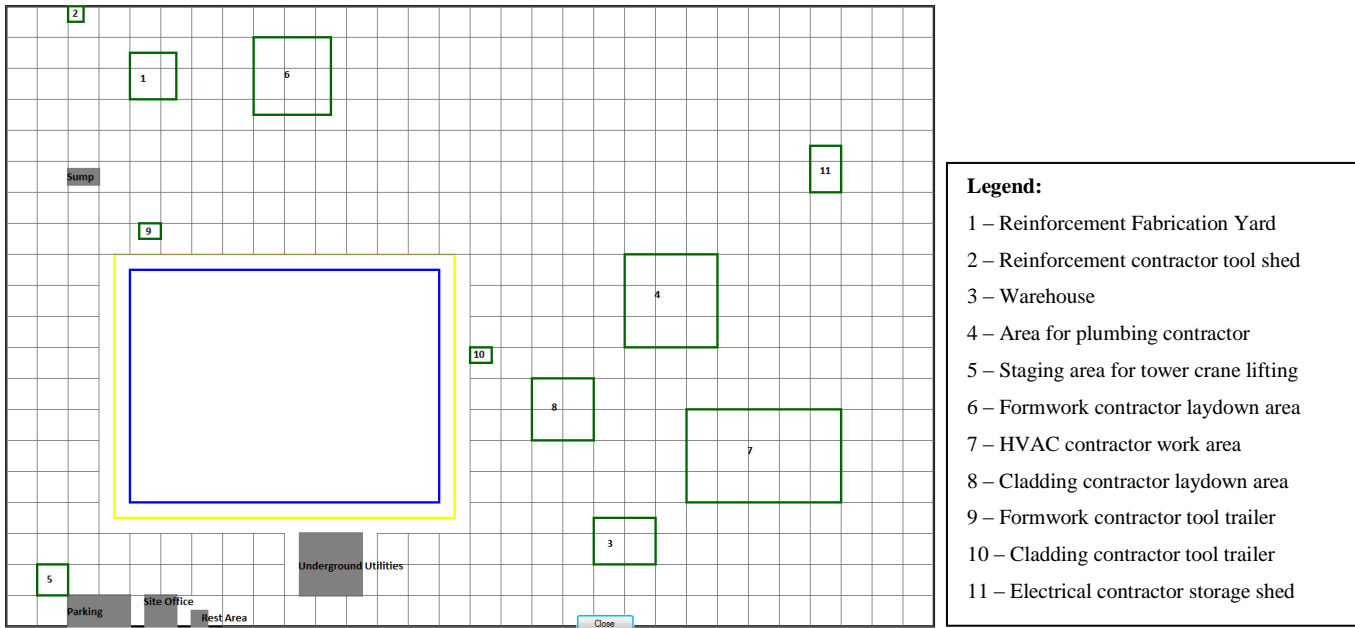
CONSITEPLAN – Site Utilization Plan 4
